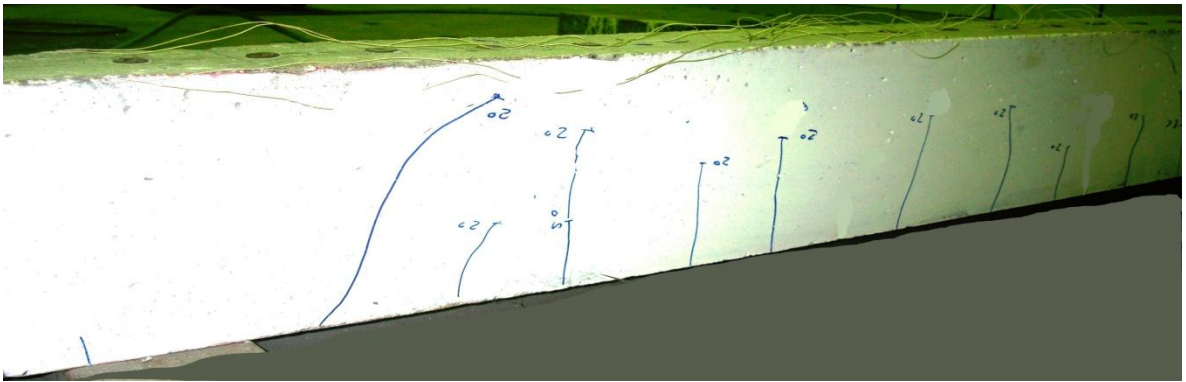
Actual crack pattern at second damage level for beam B211_q
